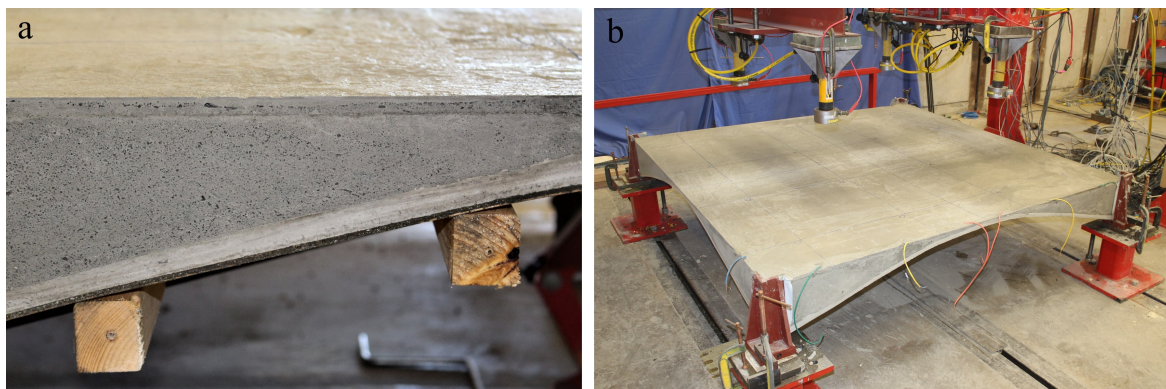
Shell 3 construction showing a) detail of formwork, shell and fill after removal of side-panel and b) the completed structure with formwork removed.
